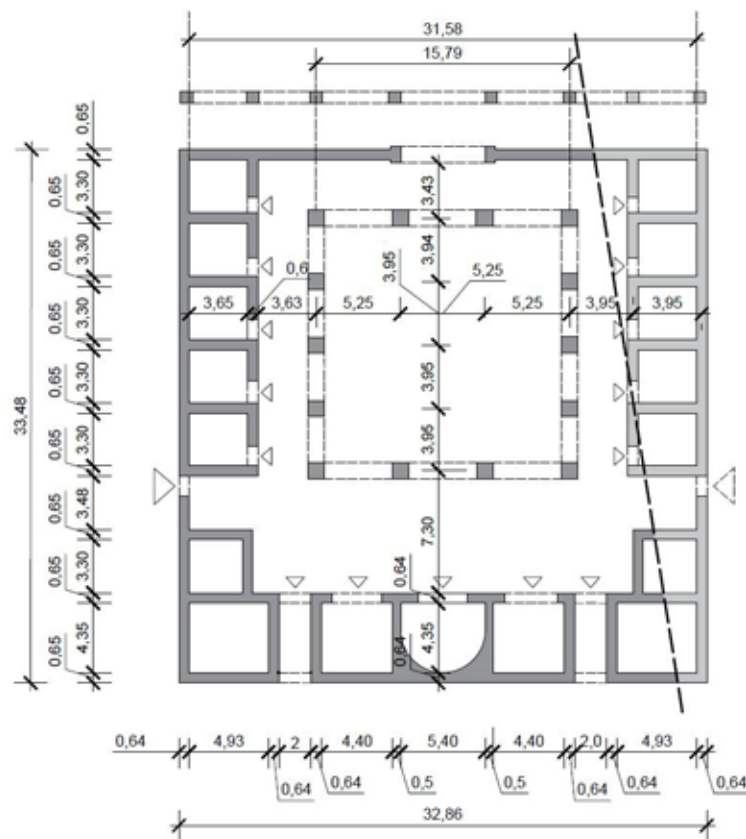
The reconstruction of the plan of Principia in the castrum of Pontes with metric measurement of the plan elements (the author's drawing).
